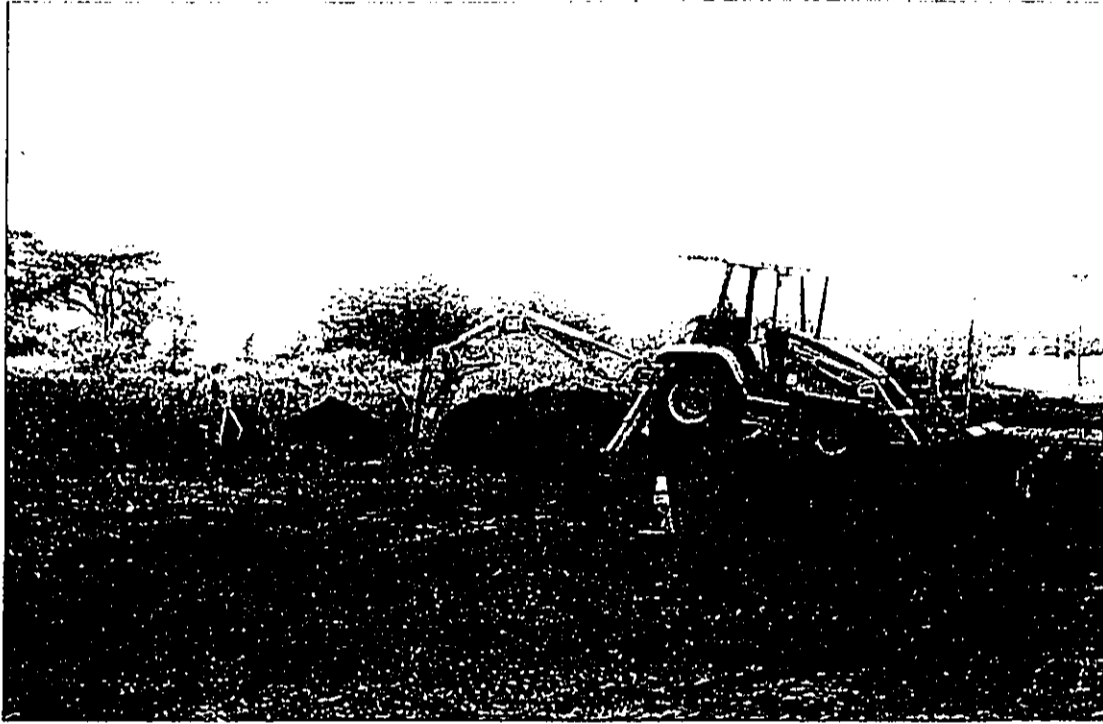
Backhoe excavating Trench 1 in Area 3, view to S.
